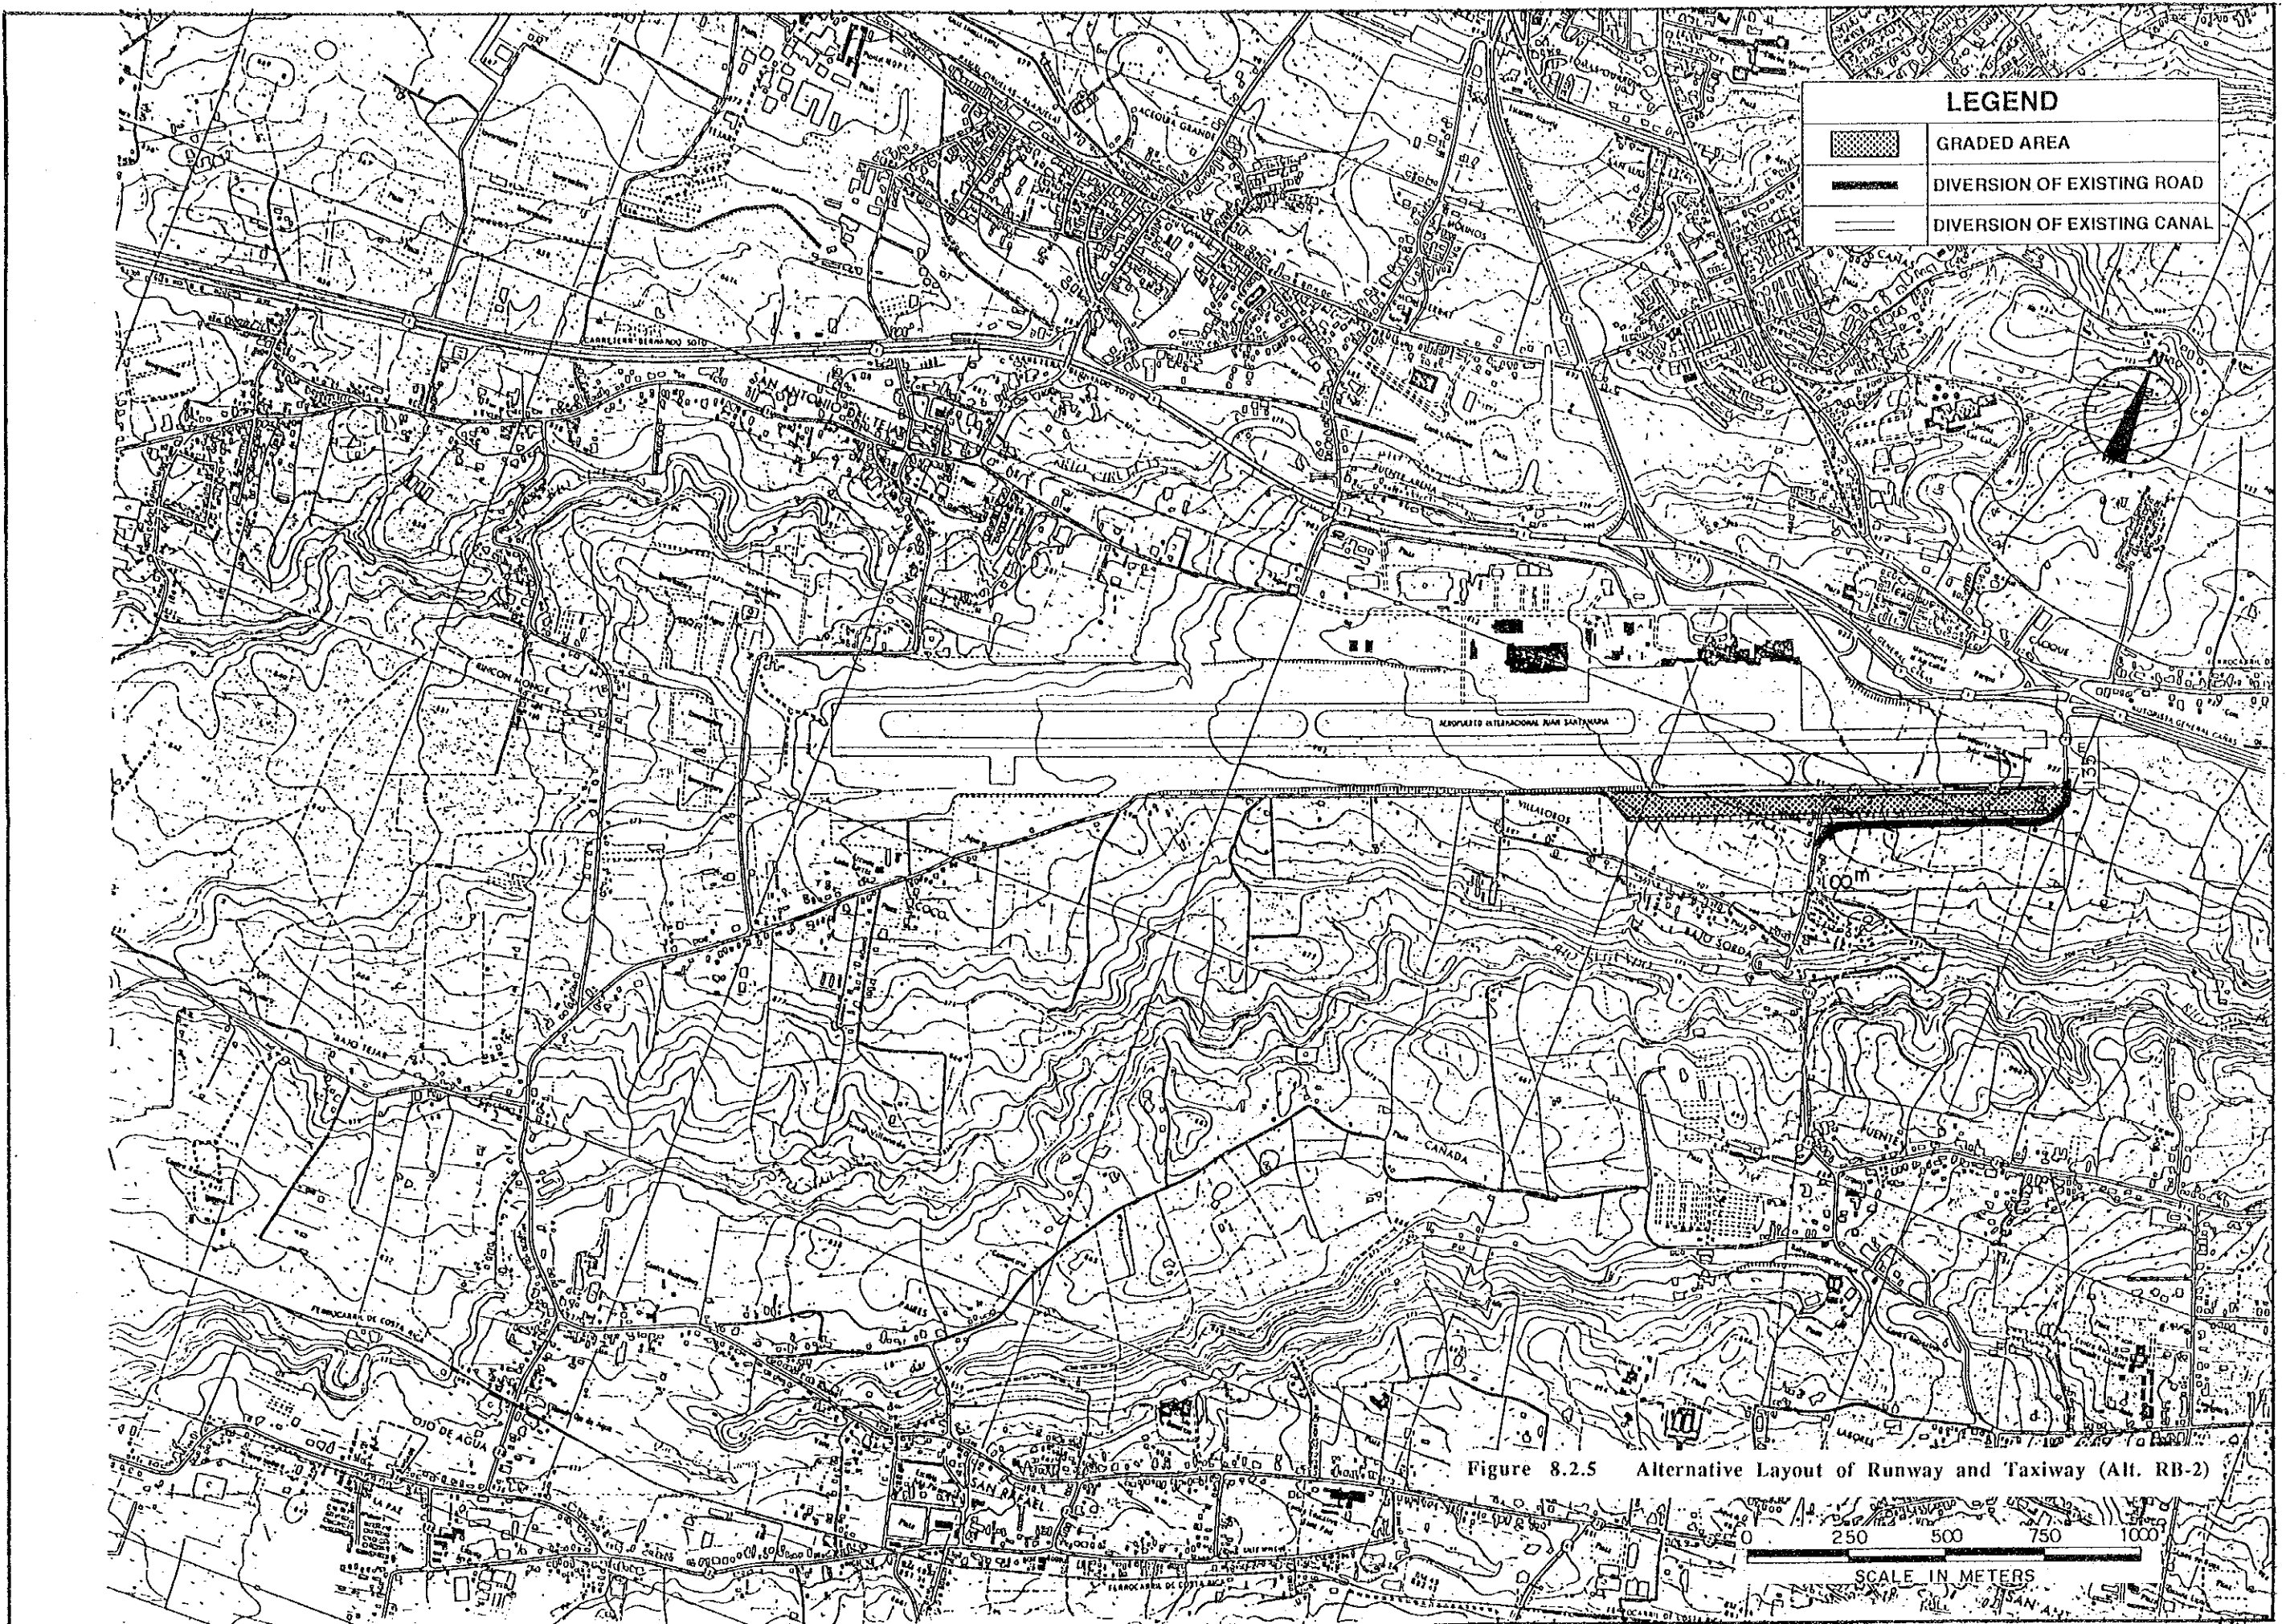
Alternative Layout of Runway and Taxiway (Alt. RB-2)
